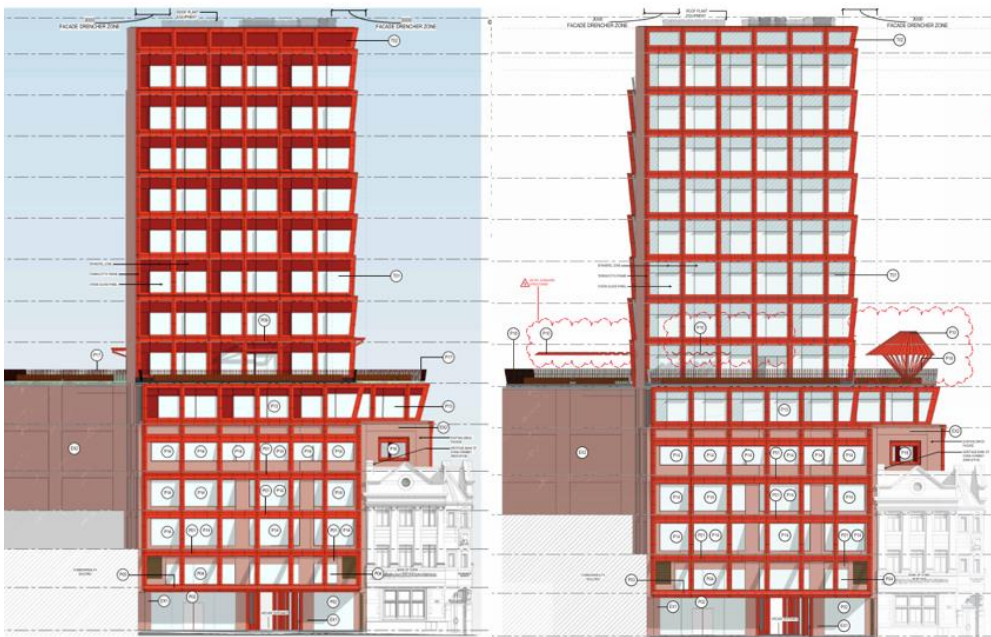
Original and amended east elevation plan showing a simplified building design. A 2 metre tower setback to the Bank of China Building has been provided (northern boundary)
